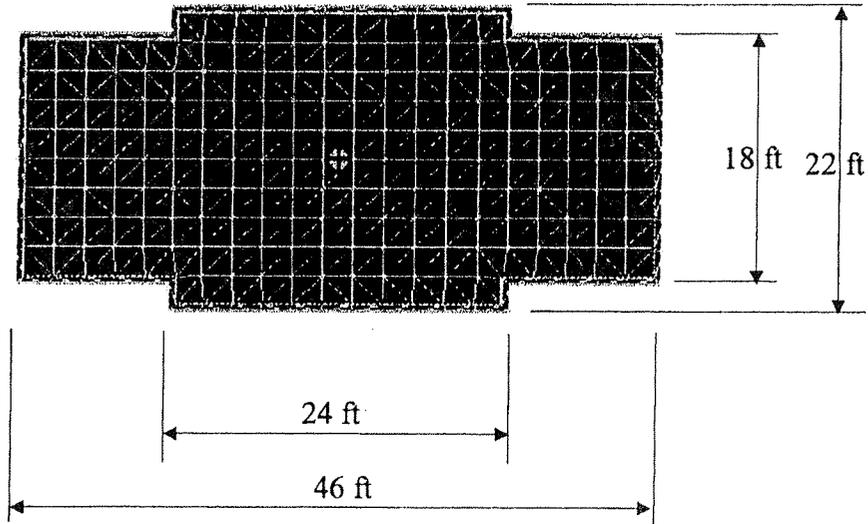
Section shape at bottom of Pier E1 (either south or north side)
